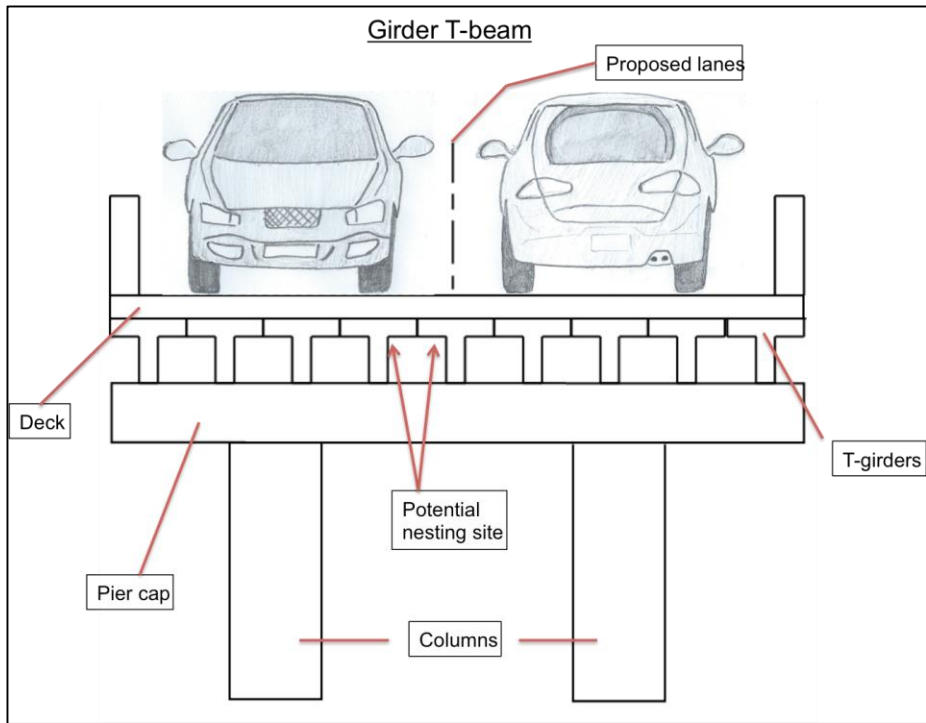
Cross-section of a girder T-beam bridge with potential nesting sites
